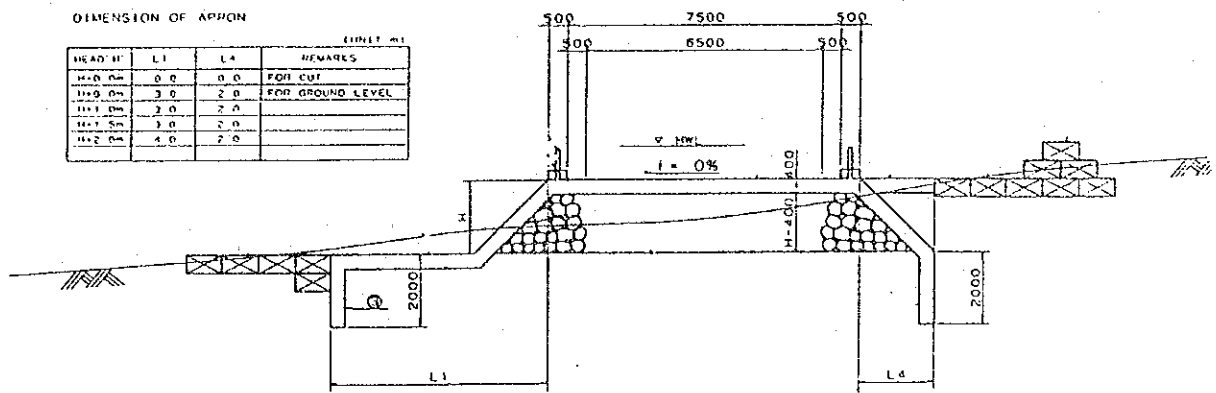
Standard Section of Riverbed Level Causeway
